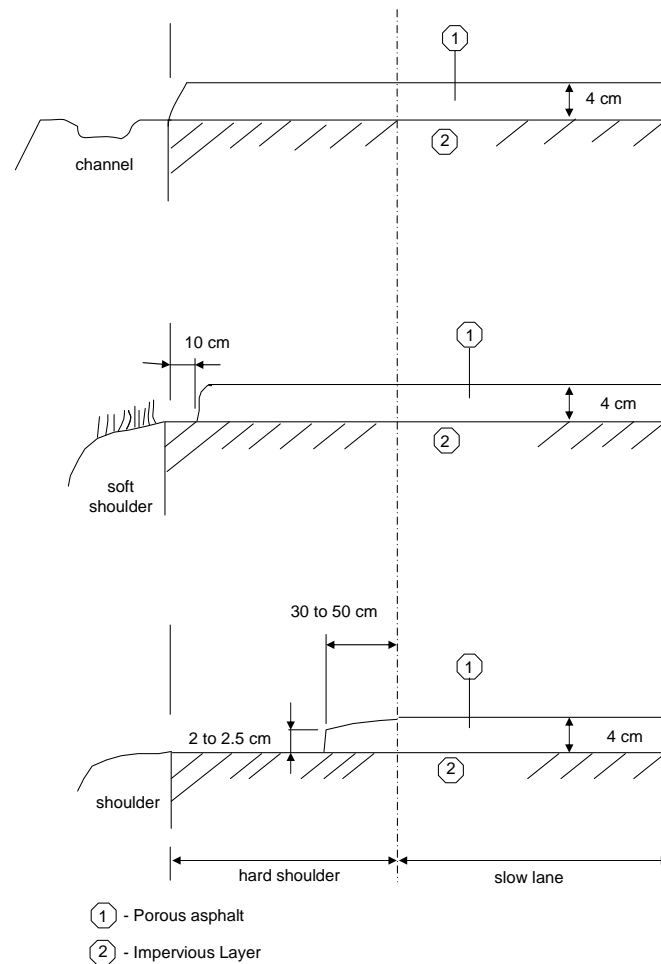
Examples of Daylighting Porous Asphalt Mixtures
